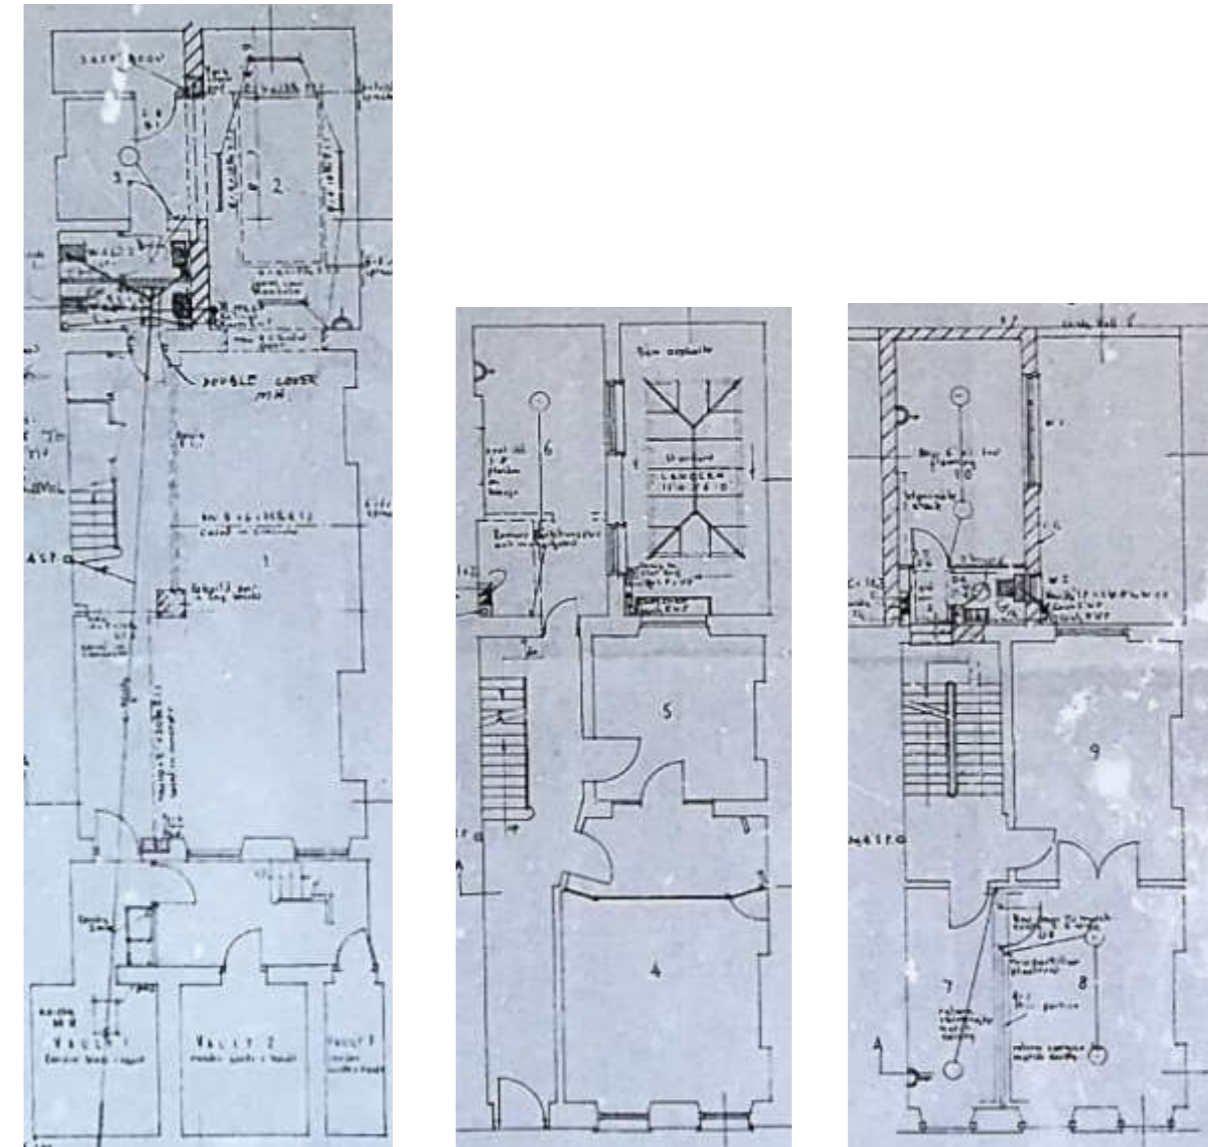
1955 drainage plans (basement, ground floor and first floor)
